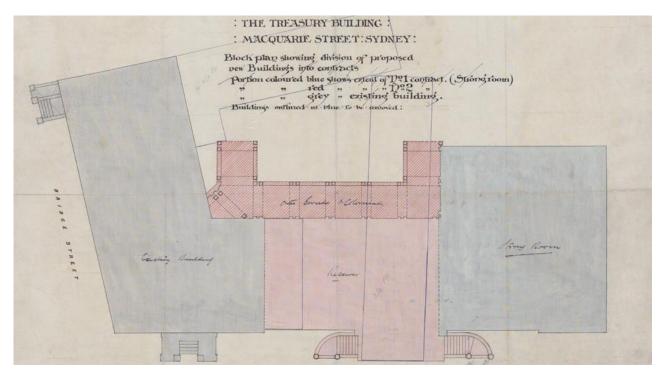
Extract of Architectural Plan for Proposed Additions to Treasury (proposed north wing including a Strong Room and Link Building with Colonnade)
